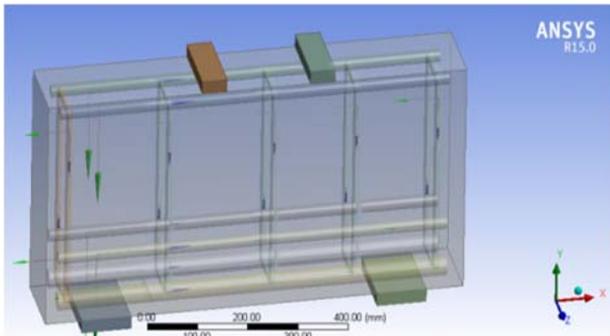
Reinforced Cement Concrete (of grade M40) deep beam modeled in ANSYS R15.0
